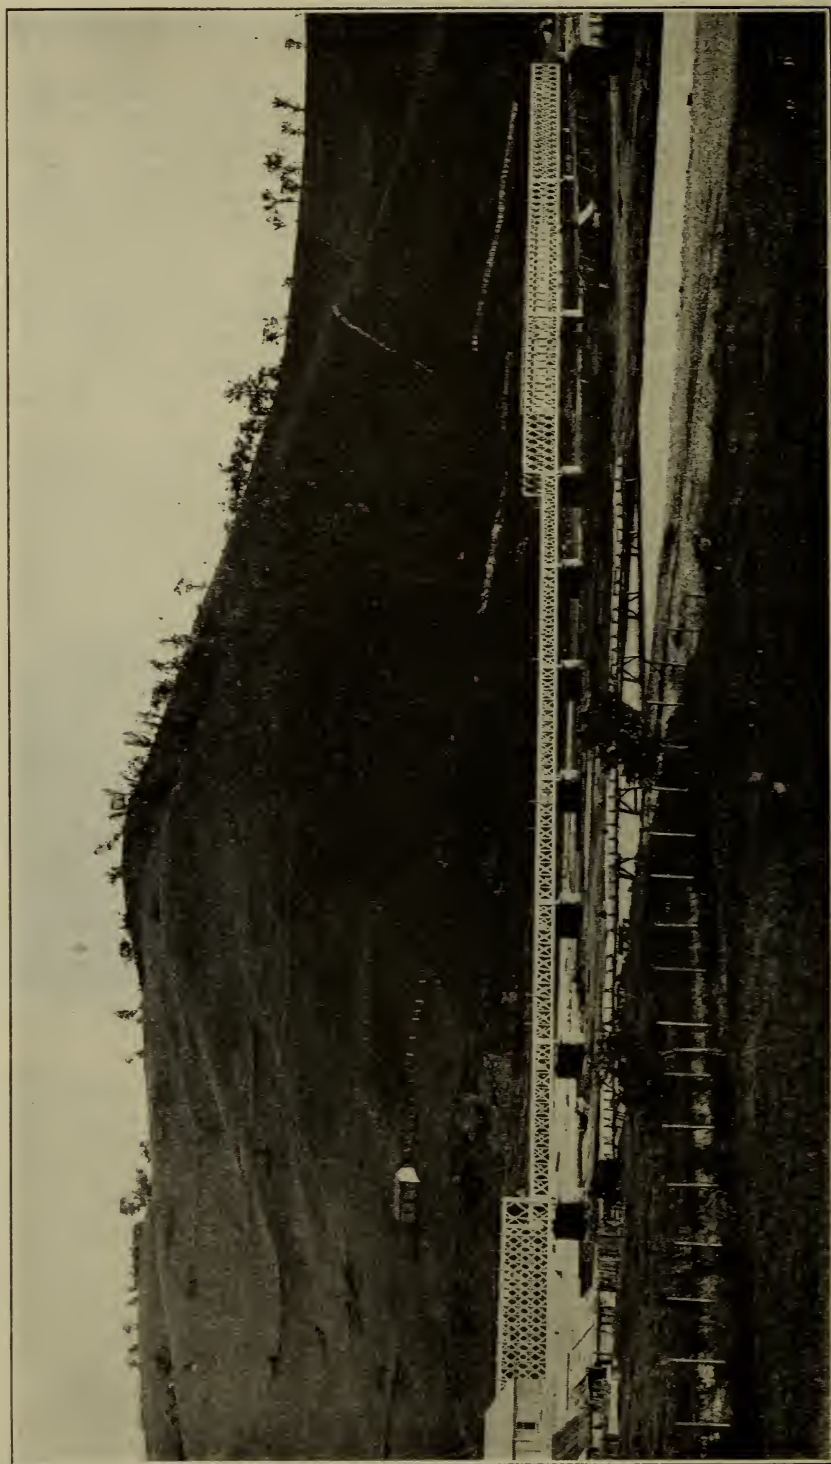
Cantin Bridge, central system, Chilean State Railways
